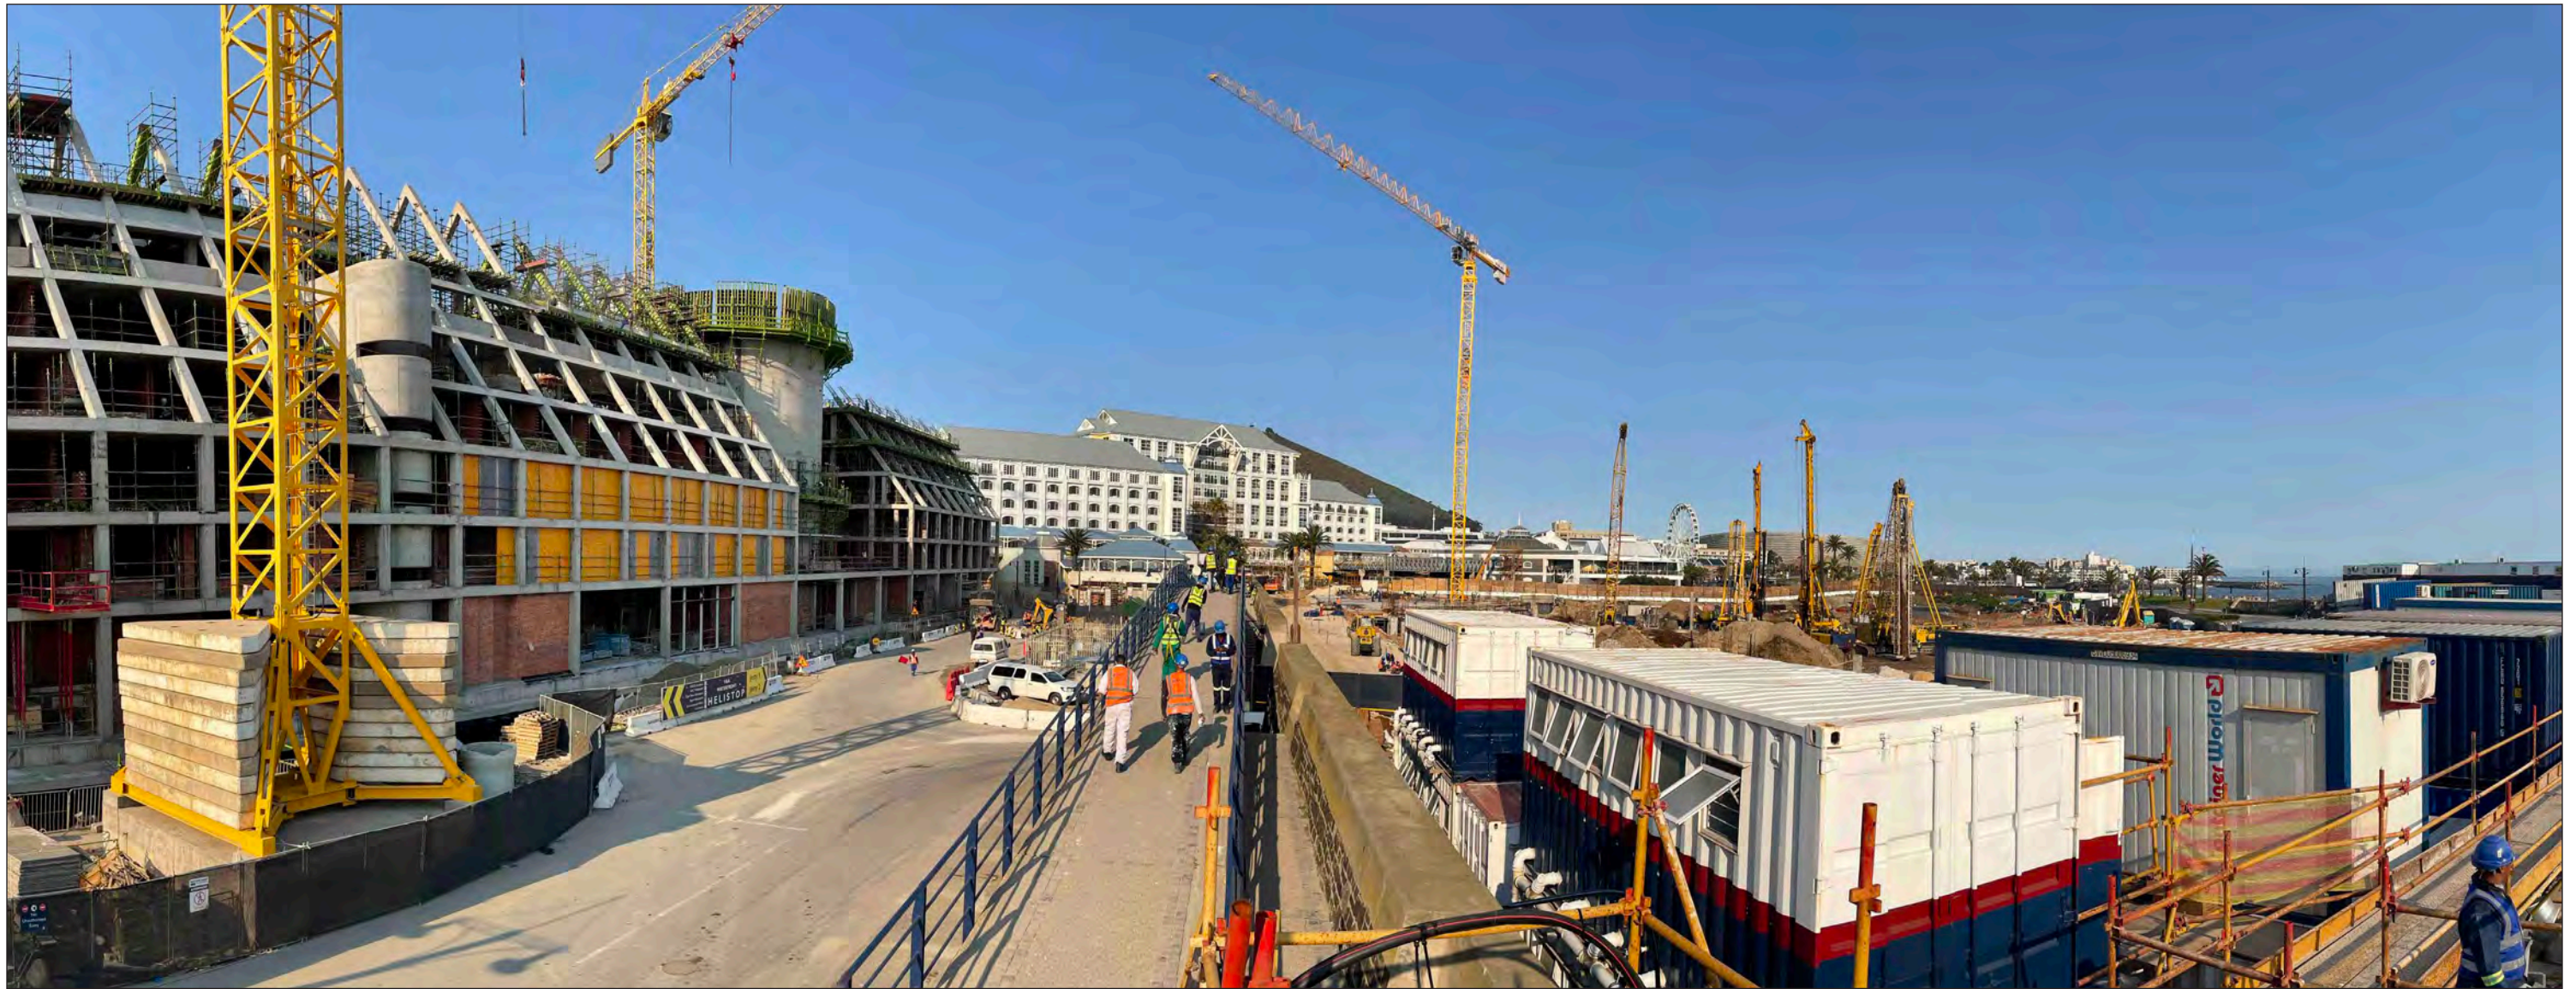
G: View from the Breakwater Wall looking over the site (with a basement being constructed). Signal Hill, the Cape Wheel and Cape Town Stadium are visible, as is Granger Bay. To the east, the Quay 7 Hotel blocks views towards Victoria Basin and Table Mountain.
